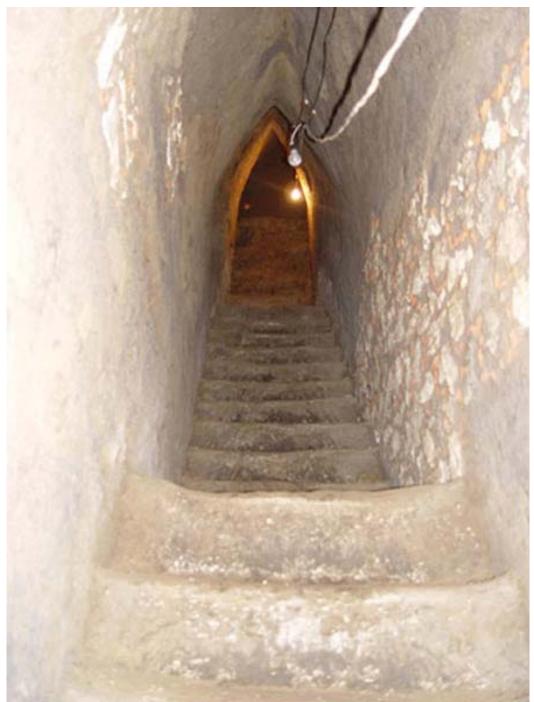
East-West tunnel, following the central staircase of phase A construction.
